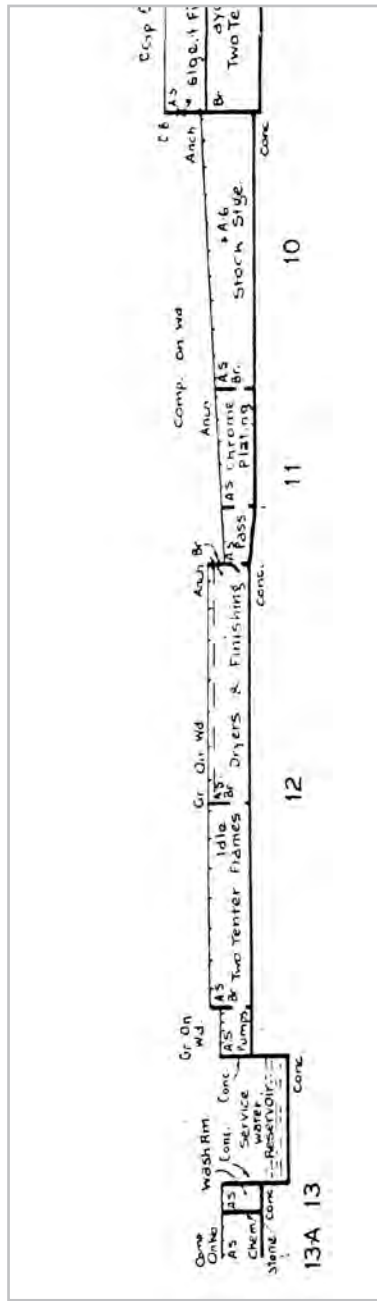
Factory Mutual Insurance Co. *Mill Realty Co.* 1965. Southwest-northeast and west-east cross-section through Buildings 13-A, 13, 12, 11, 10, 8, 3, New Addition and Todd Building No. 5. Scale: 1 inch= 30 feet (approximately).
